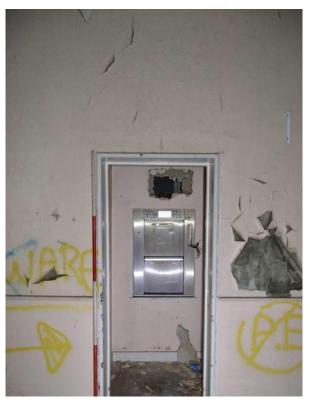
Modern dumb waiter added to the surgeon's sitting room. Scale 2m. Facing north west.
